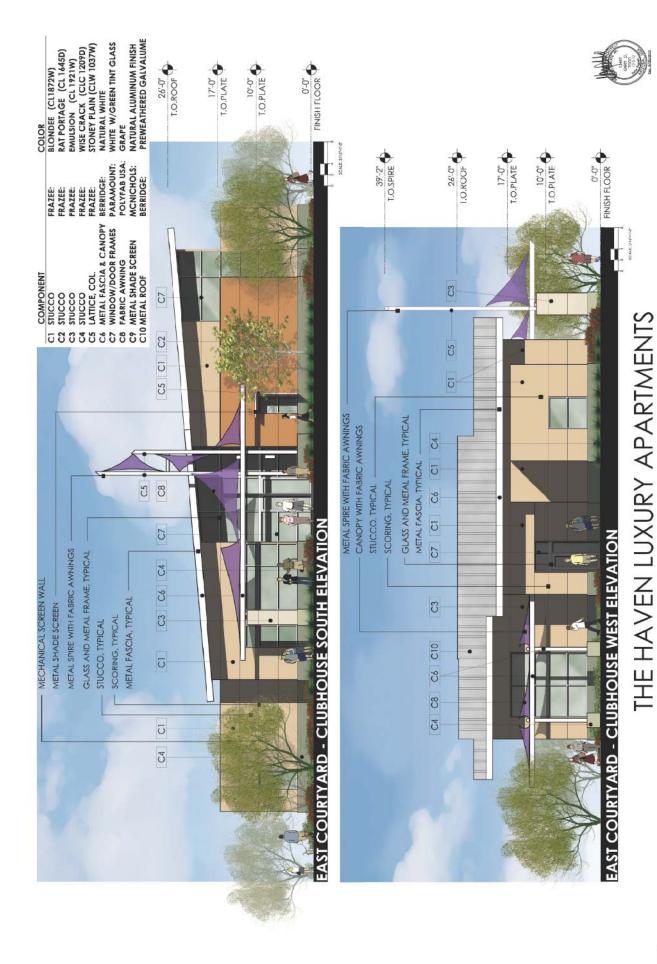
### PHOTOS EXTERIOR CLUBHOUSE WEST APARTMENTS HAVEN LUXURY
